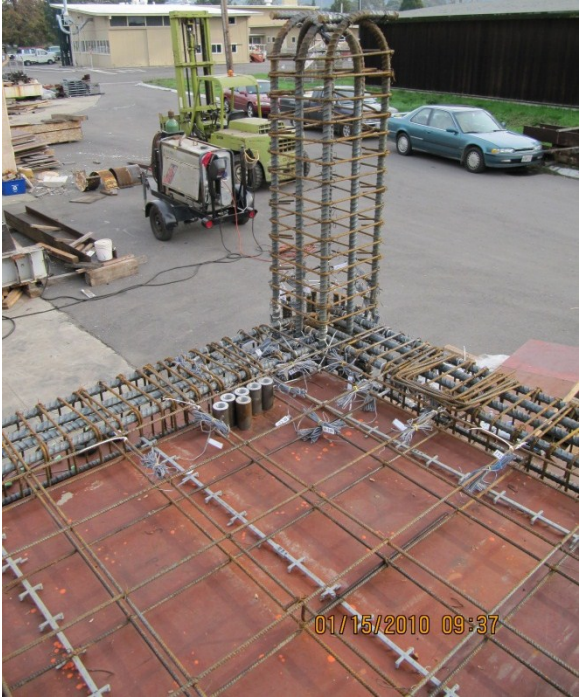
Deck reinforcement and lower column headed bars of test specimens
